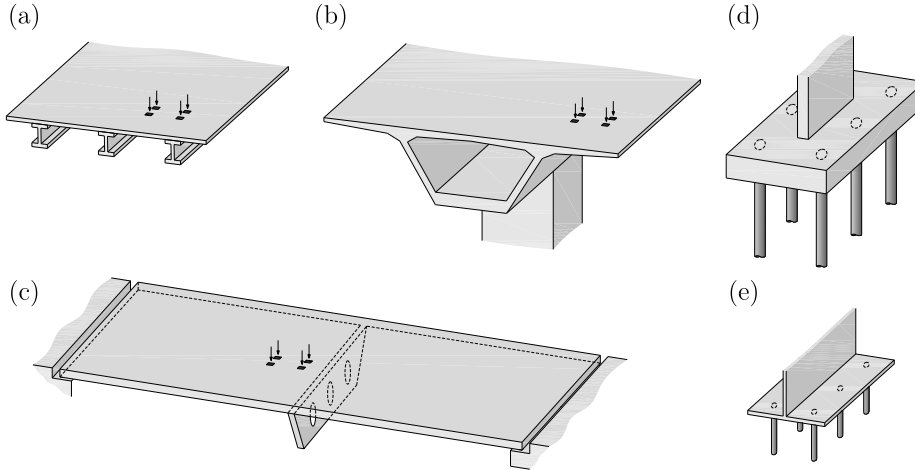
RC slabs subjected to concentrated loads near linear supports: (a) girder bridge; (b) box-girder bridge; (c) slab bridge; (d) pile cap; and (e) slab loaded by wall and supported by piles or columns
